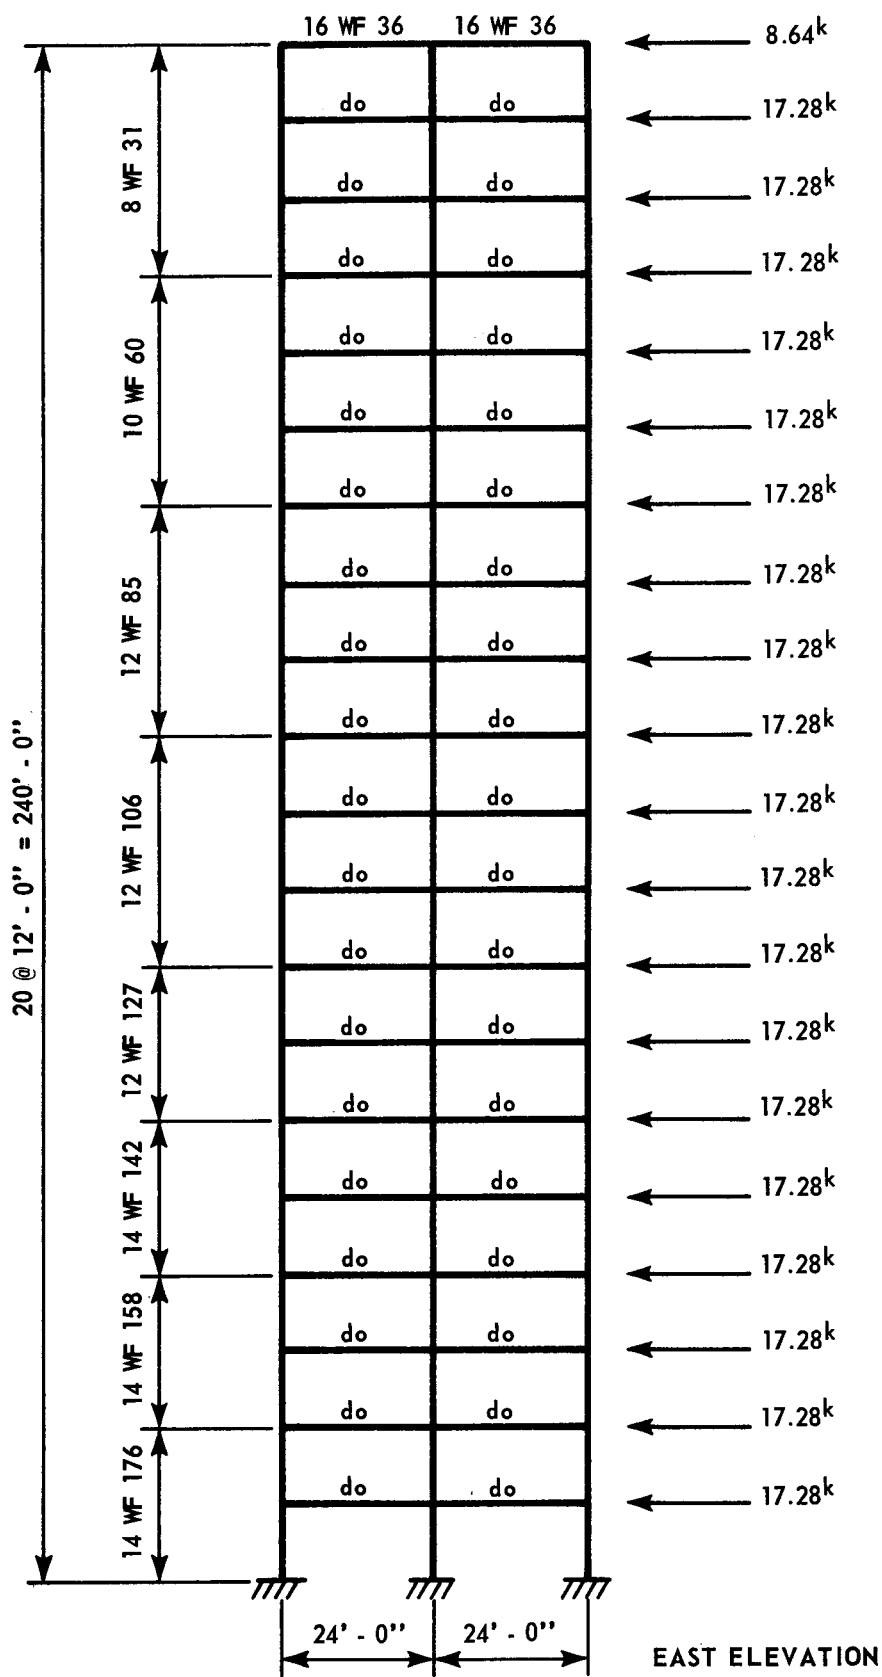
ELEVATION TWENTY STORY STRUCTURE
